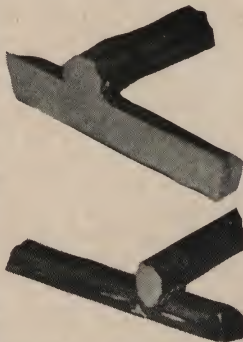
Detail of Weld used in Barmats and section through Weld
